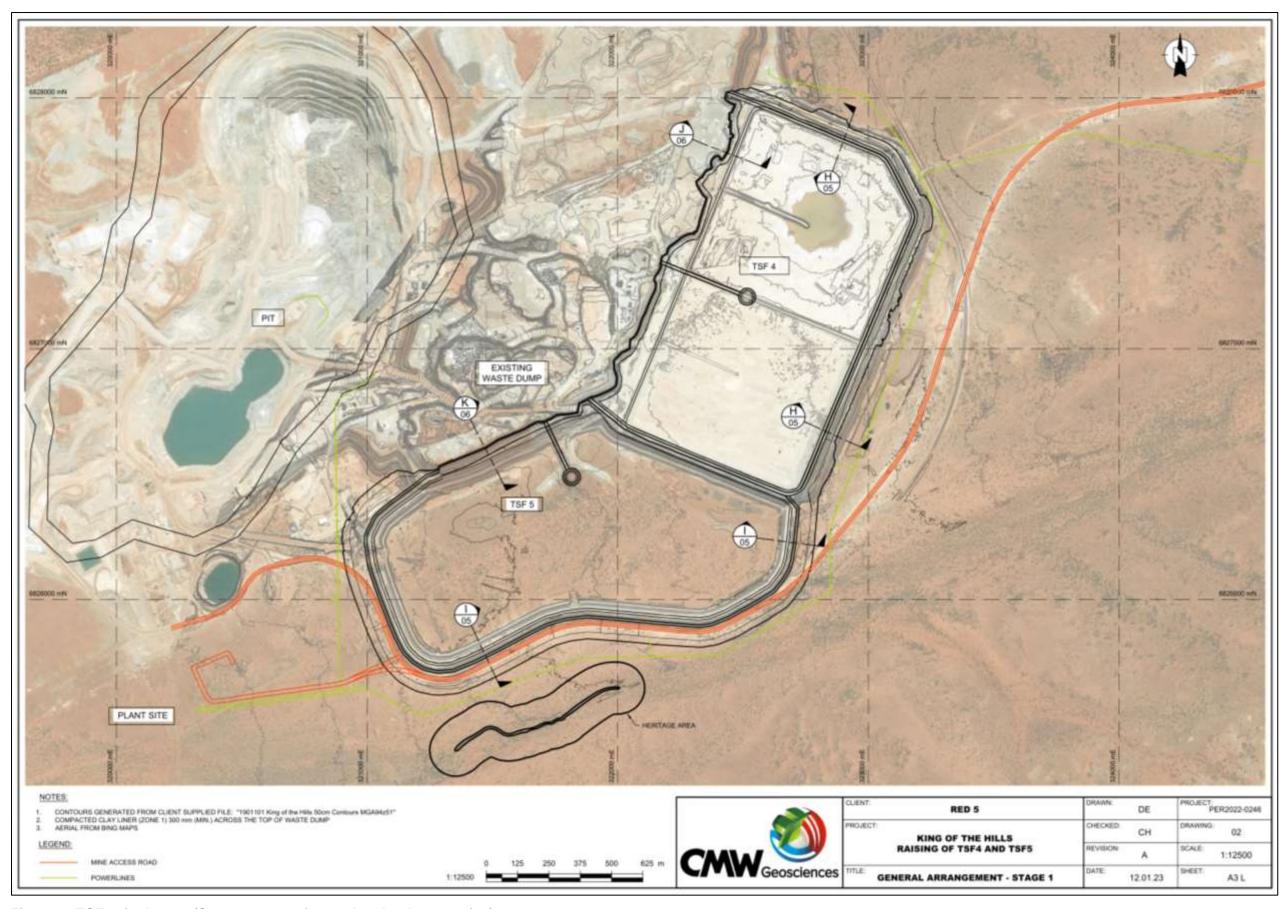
TSF4 site layout (Stage 1 expansion and embankment raise)
